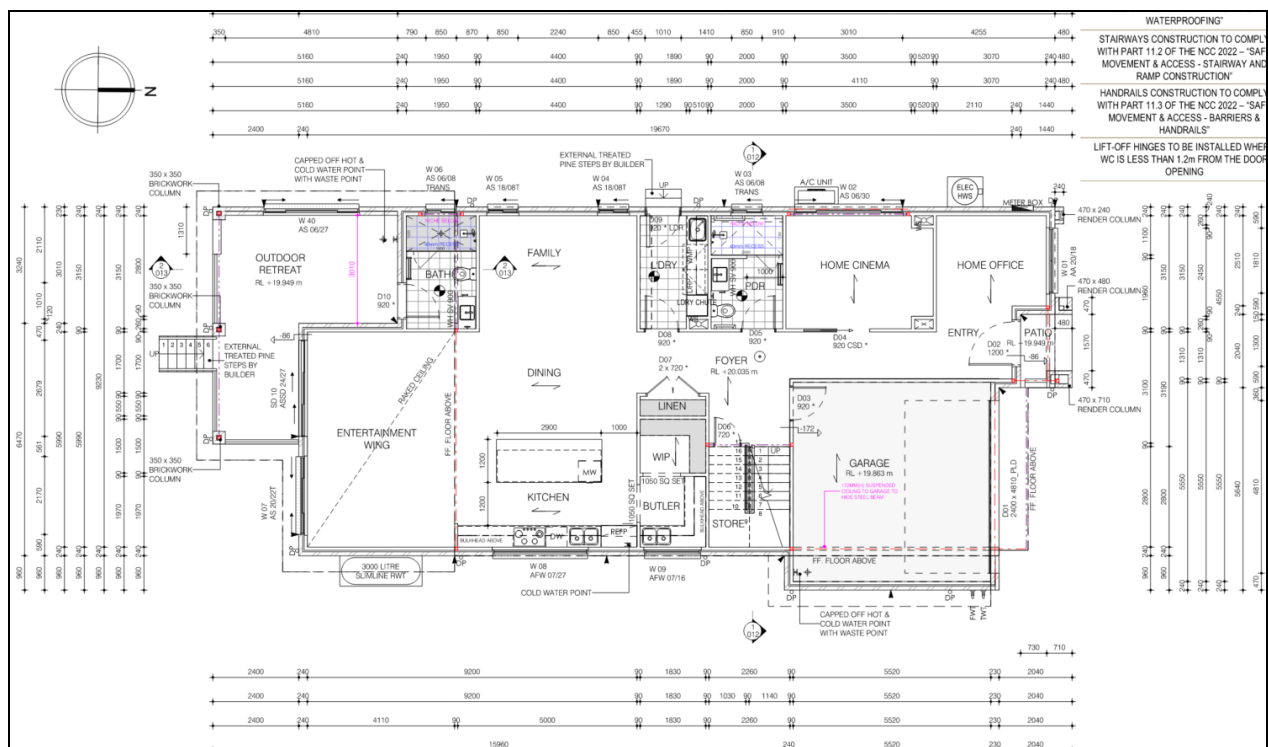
Proposed Principal Dwelling Ground Floor Plan (Source: Fowler Homes, 2026)
